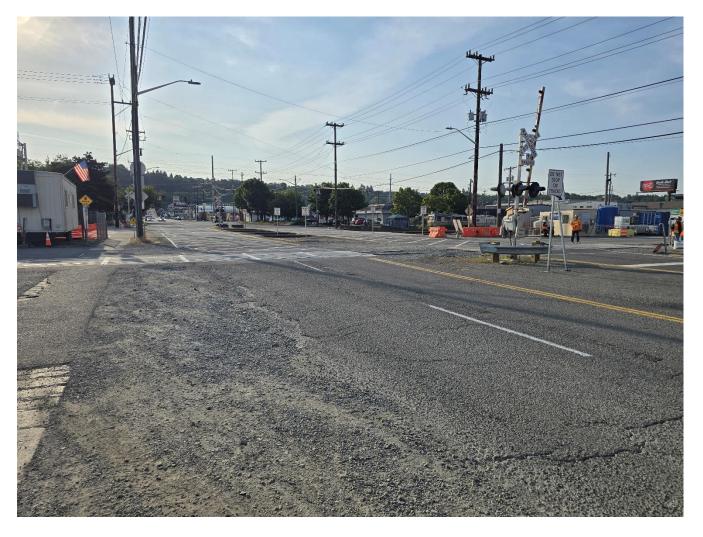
S HOLGATE ST AND DOT# 927461X, PAVEMENT CONDITION SHOWING ALLIGATORING, LONGITUDINAL AND LATERAL CRACKING, NW CORNER LOOKING SE
